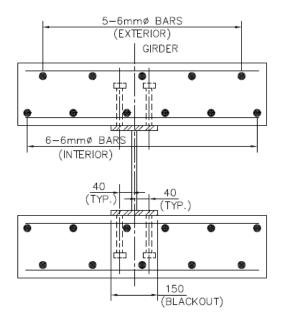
Schematic diagram of the test specimen showing slab reinforcement and stud locations
